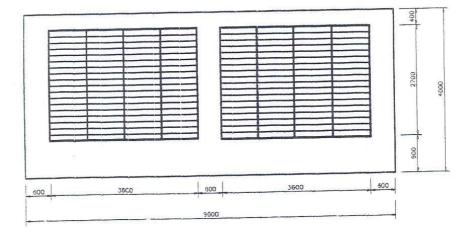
WINDOW ELEVATION AT 600mm MODULE
